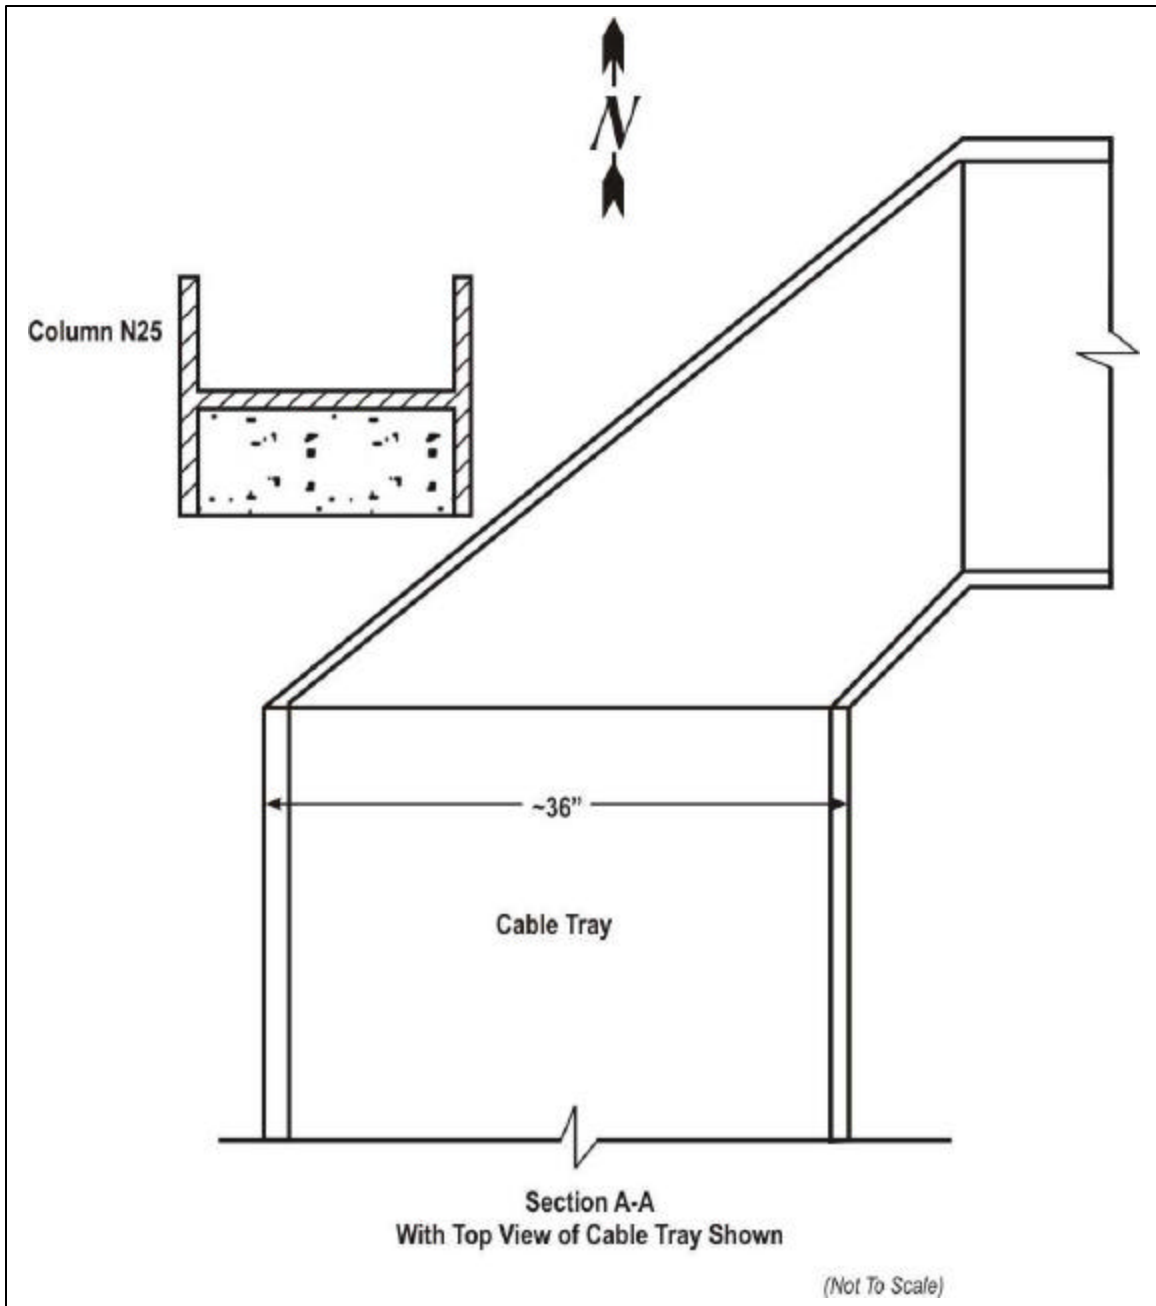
Elevation Schematic of Column N25 Depicting Where Pipefitter was Working
